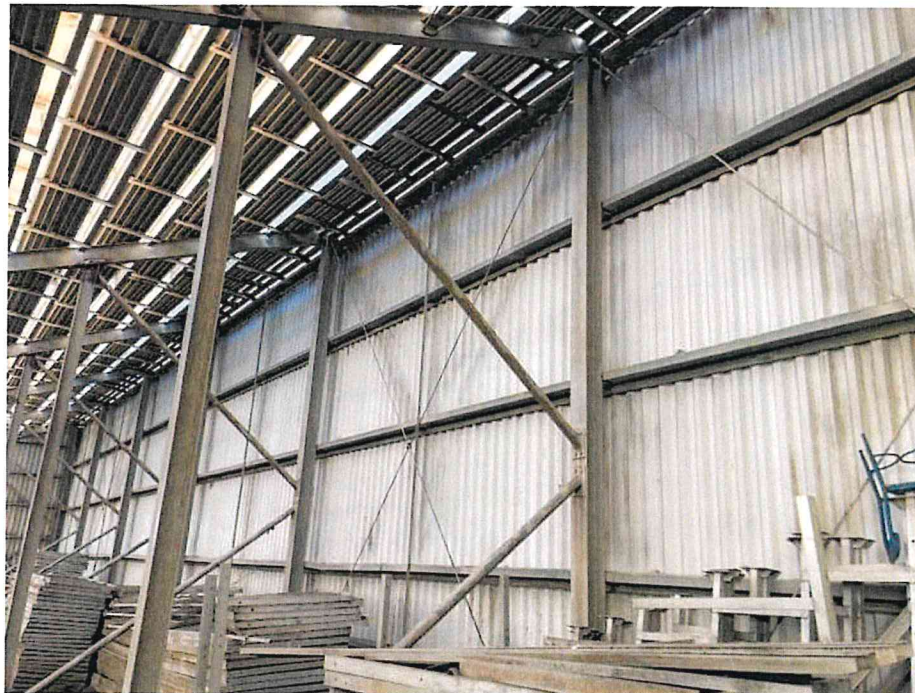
Photo showing grandstand structural elements (looking toward rear)
